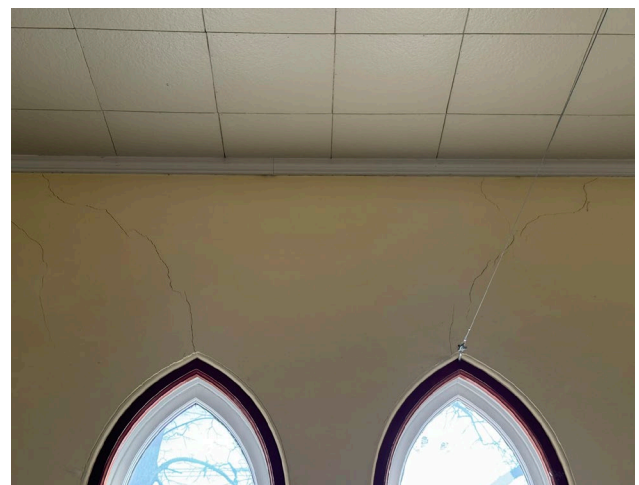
Cracking at the pointed window arch visible at majority of the openings
